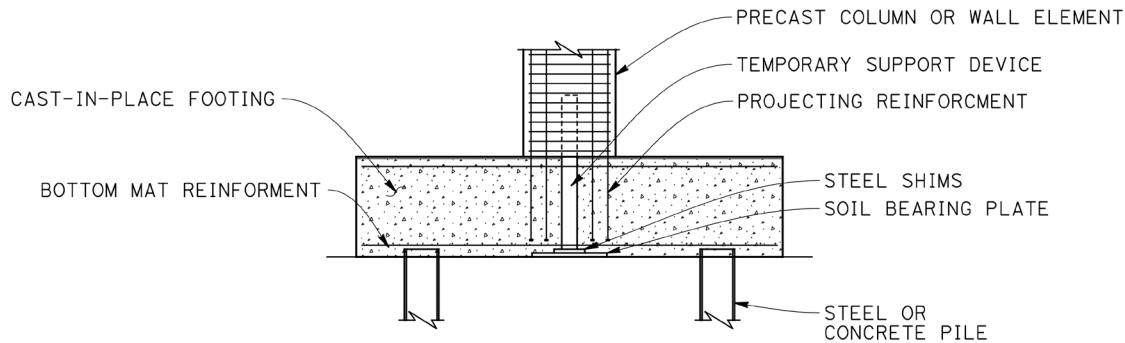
Fixed Precast Column to Cast-in-Place Footing Connection
